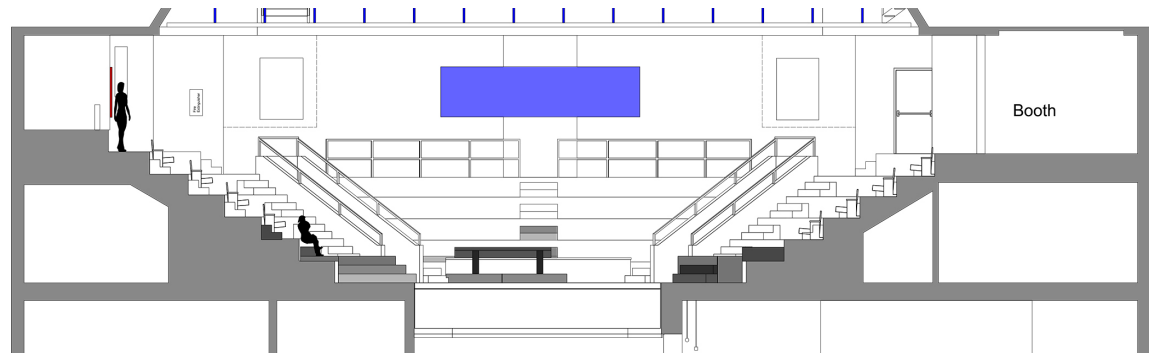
Much Ado About Nothing* section drawing facing west.
